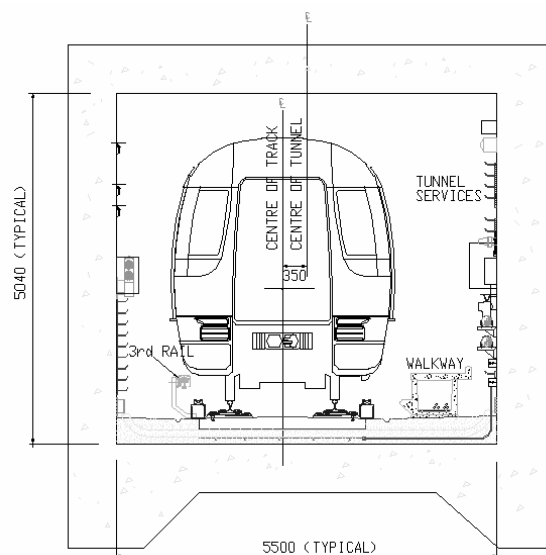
Typical cut and cover tunnel section on a straight alignment (adopted from Alstom (2001a) and Alstom (2001b))
